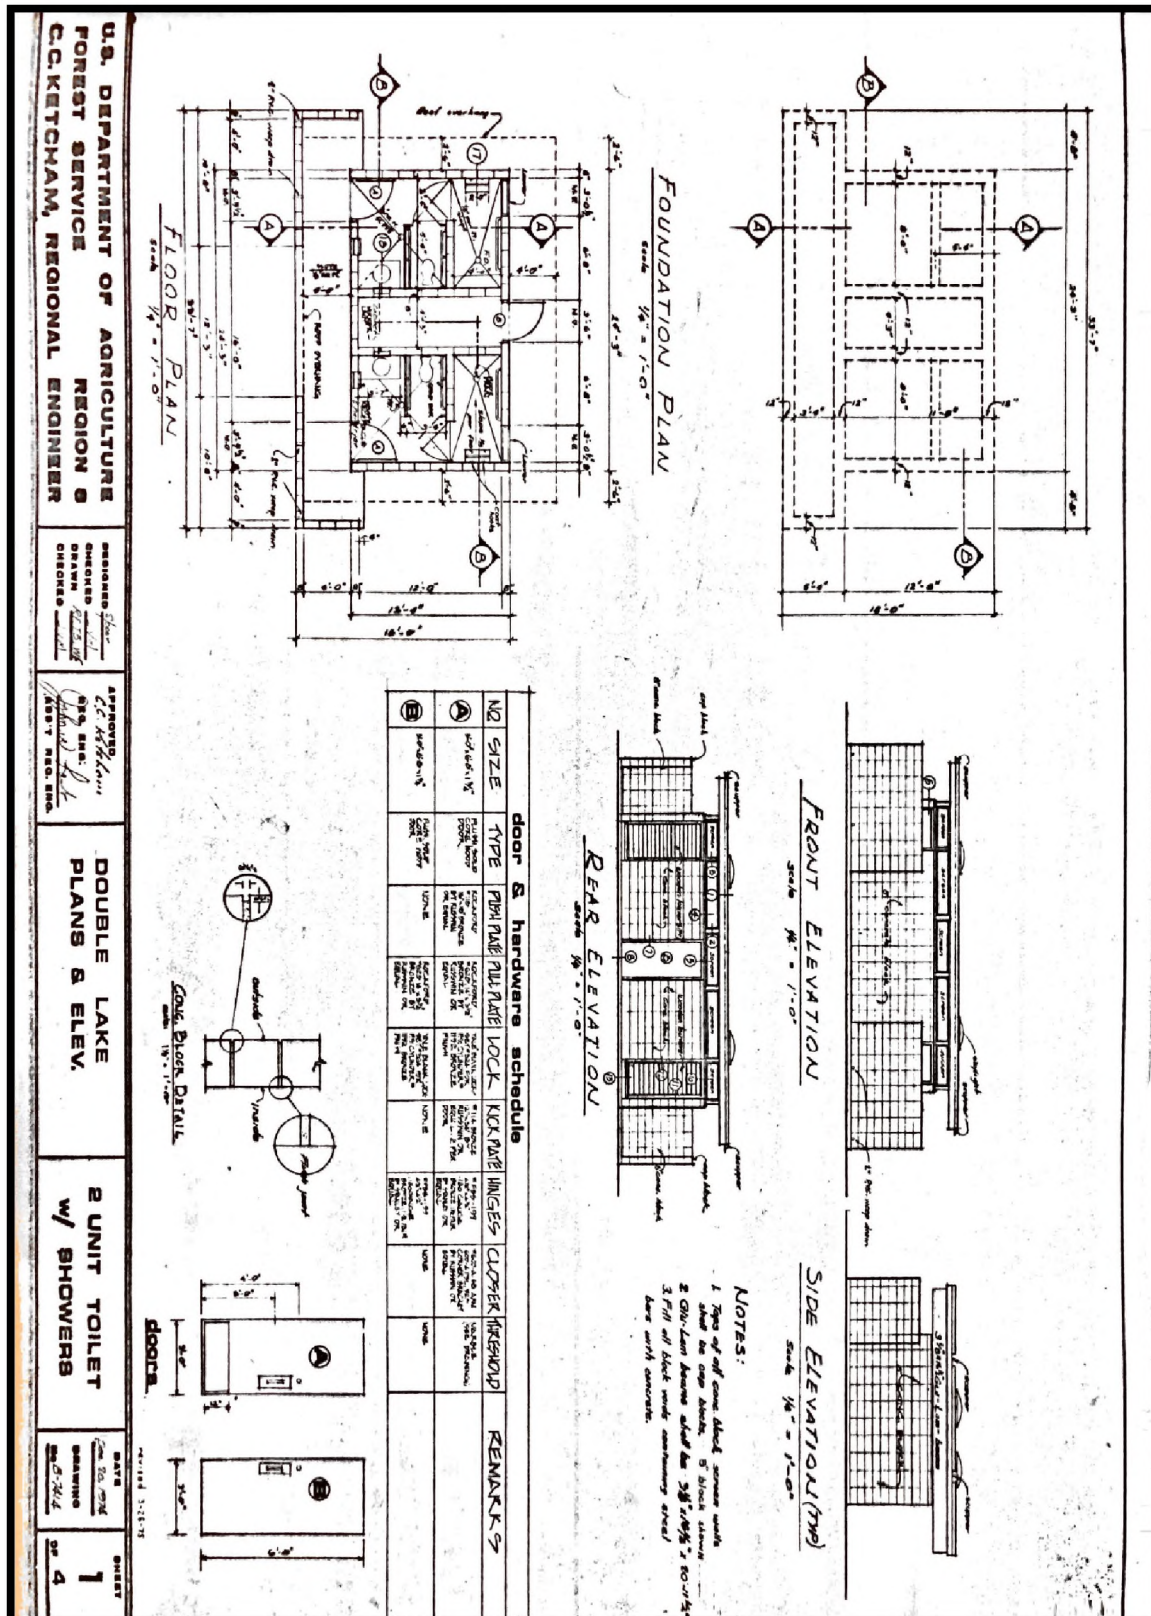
Building Plan (B-7414) for Woods Ferry Bath House “Two Unit Toilet with Showers.”
